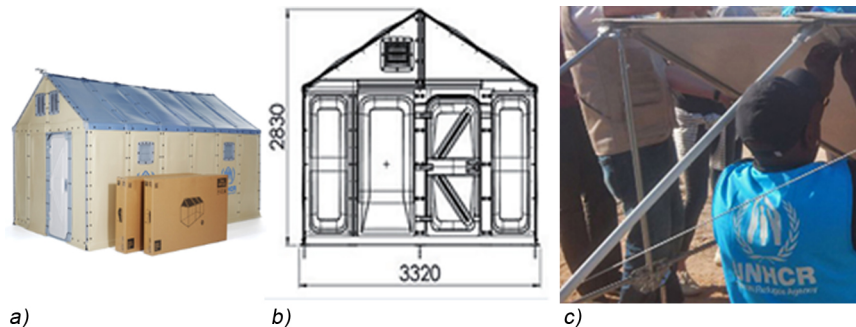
Refugee Housing Unit (RHU). (a) the constructed shelter Source: (UNHCR Shelter and Settlement Section 2024). (b) section drawings. Source: (UNHCR Shelter and Settlement Section 2023). (c) construction details of a roof joint. Source: (UNHCR Shelter and Settlement Section 2024).
